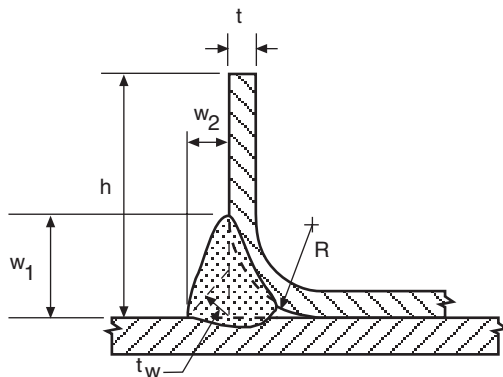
Flare Bevel Groove Weld
